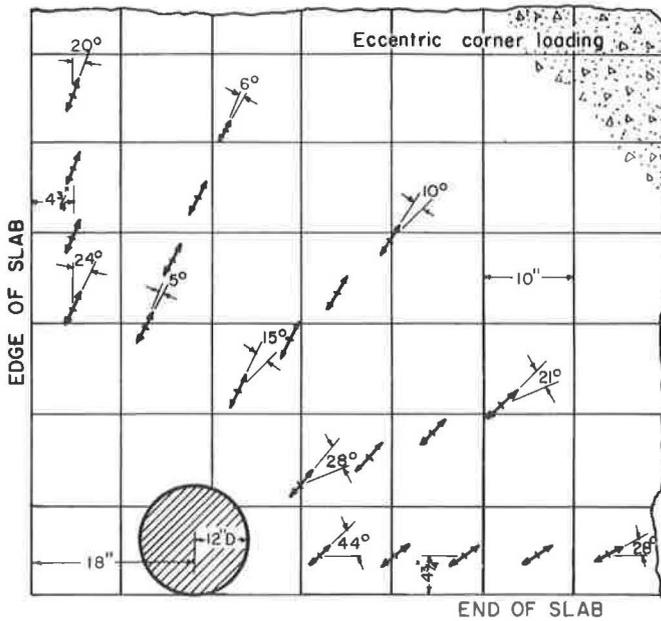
Direction of stresses, BPR Arlington tests, eccentric corner loading.
